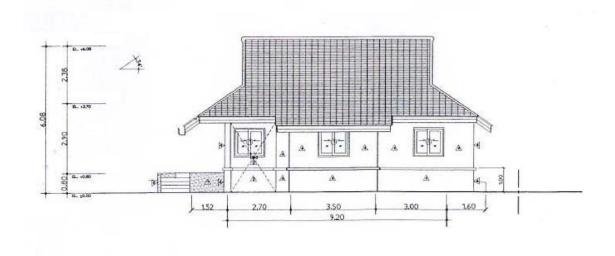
Typical House Model in West View (Department of Alternative Energy Development and Efficiency, n.d.)
